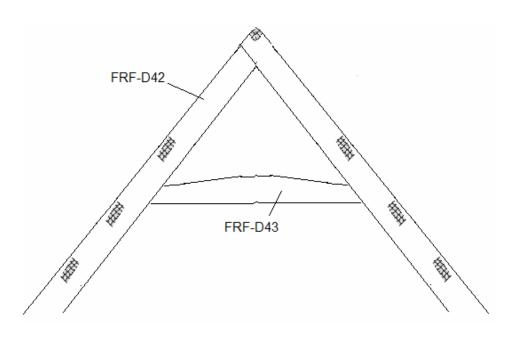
Connecting range; sketch of truss 13, showing the location of samples FRF-D42 and FRF-D43
